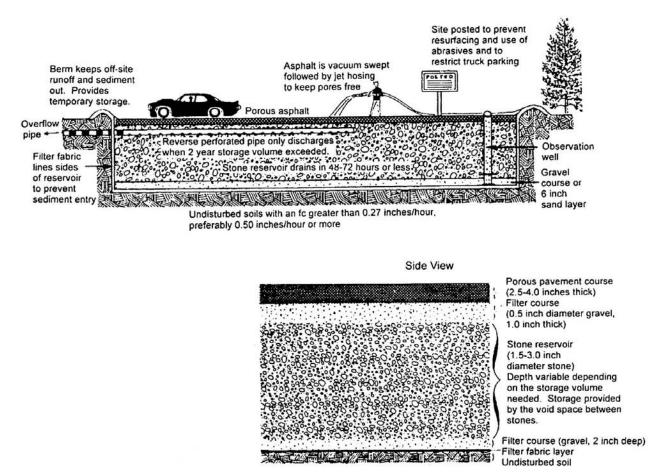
Schematic of a Porous Pavement (Schueler, 1987)
